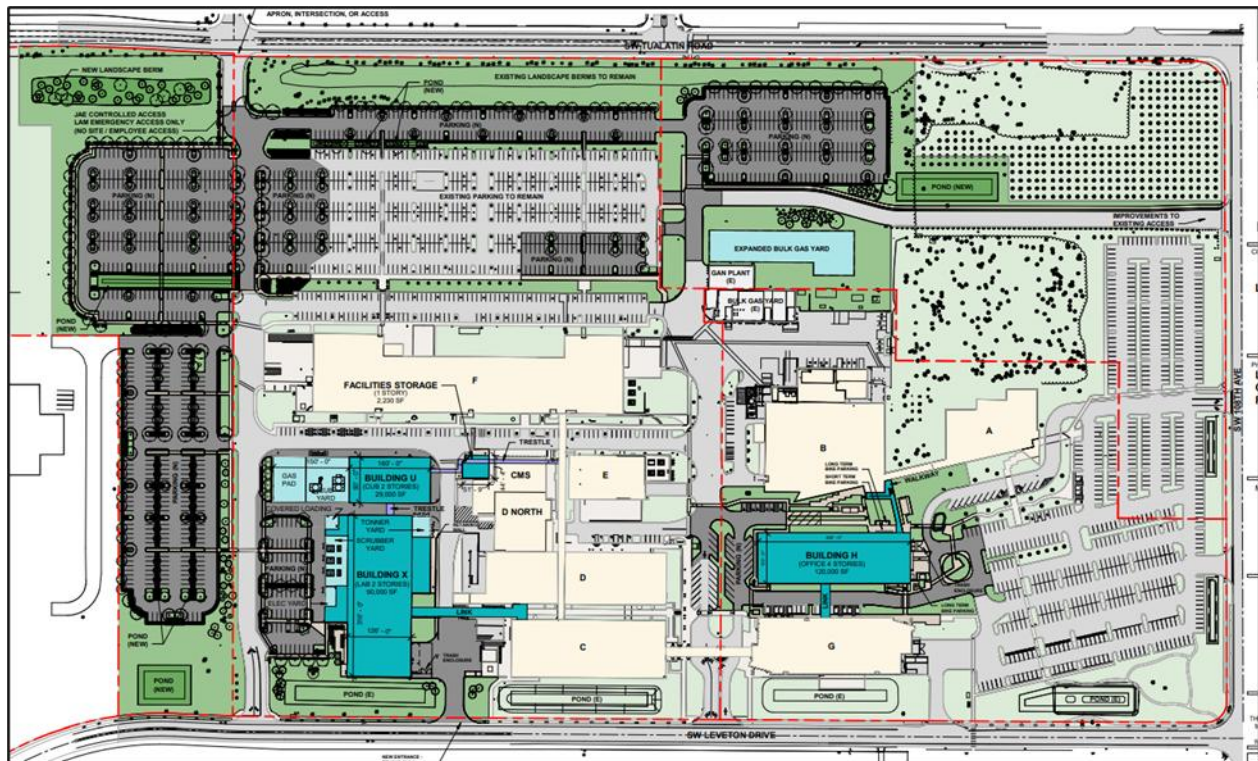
Site Plan (overview, dark gray and blue areas are locations where new development is proposed)
